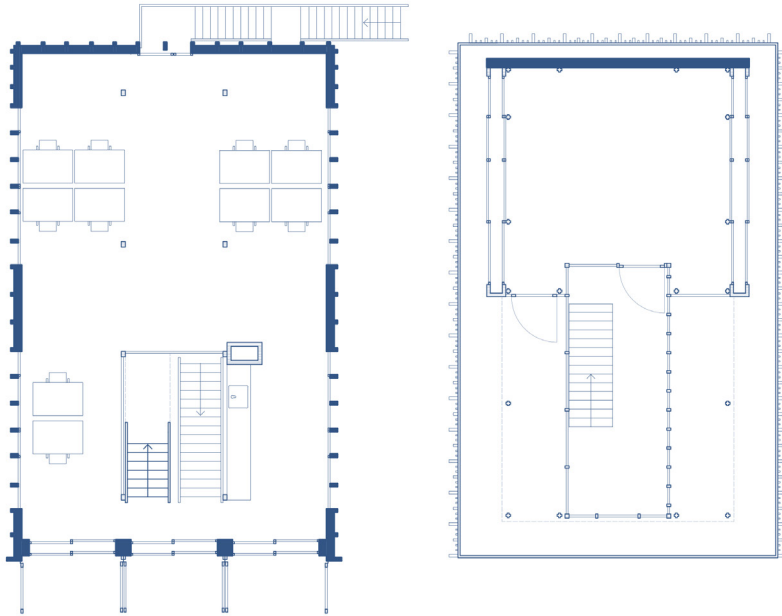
Second Floor (Left) and Rooftop (Right) of PIT Lab
